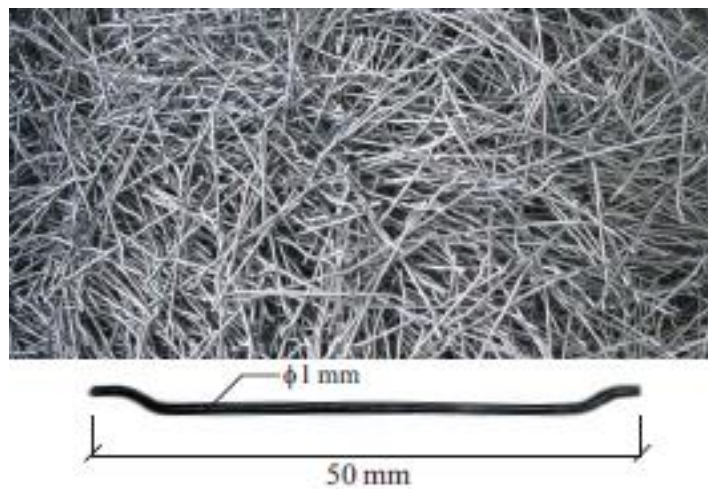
Steel Fibers used as Fiber Reinforcement and its Geometry [9]
